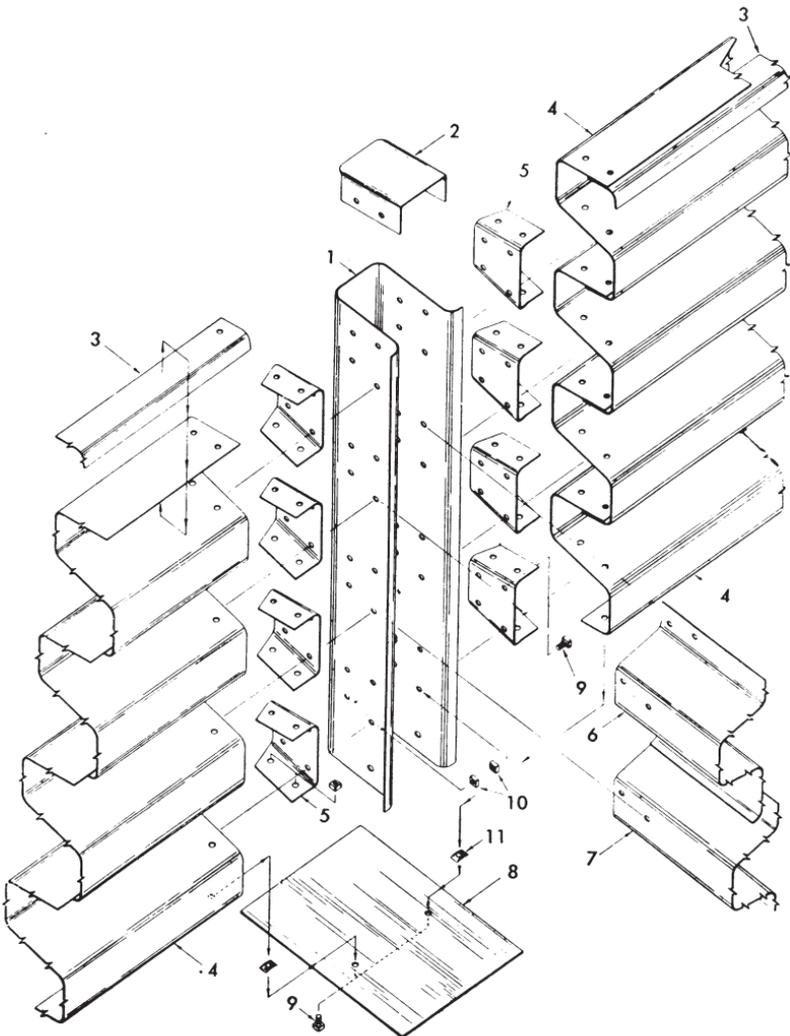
Exploded view of front panel joint Type I steel binwall as seen from the inside.
